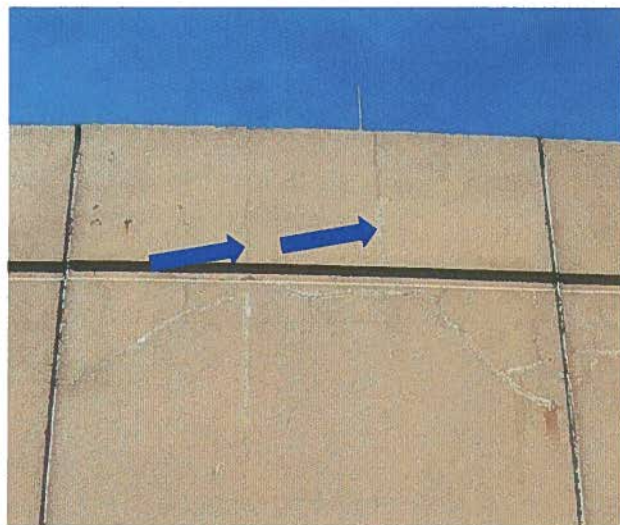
Vertical cracks aligned with prestressing strands (arrows; Brenner photo)
